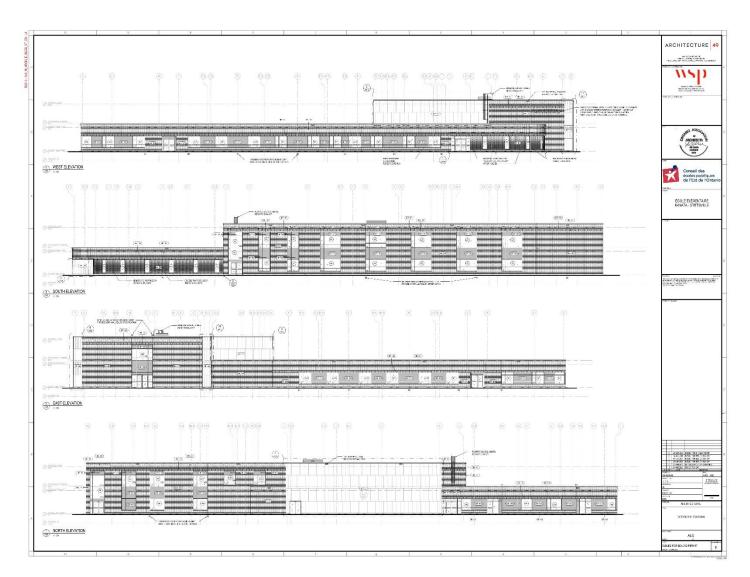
Proposed Building Elevations (Architecture 49, March 21, 2022)
